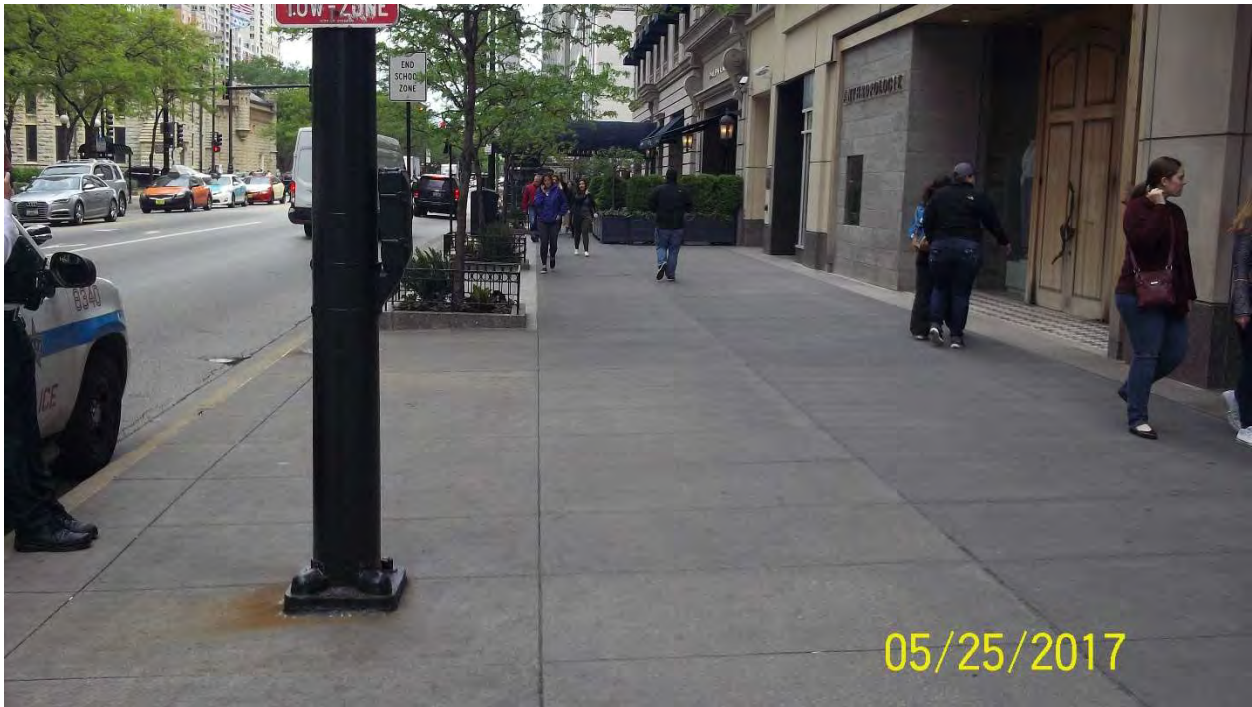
Southeast corner of Chicago Ave. / Rush St. – Looking East
